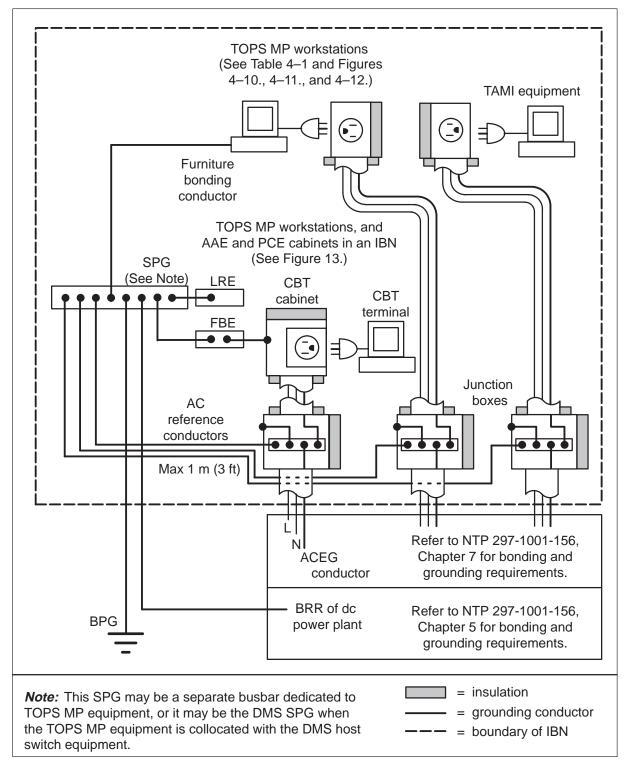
TOPS MP grounding: typical single-floor IBN installation
